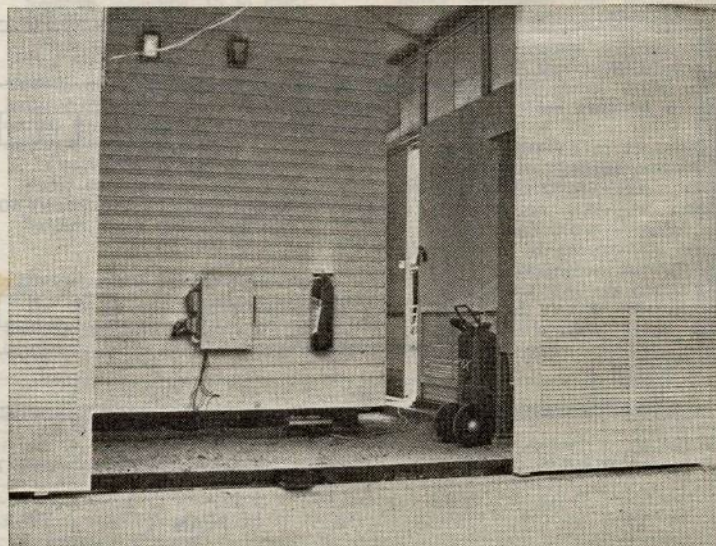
End View, Doors Open, Showing Diesel Enclosure and Inner Shell.
